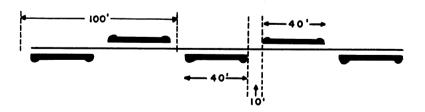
Enlargement of ditchbank showing proposed spoilbank placement.
